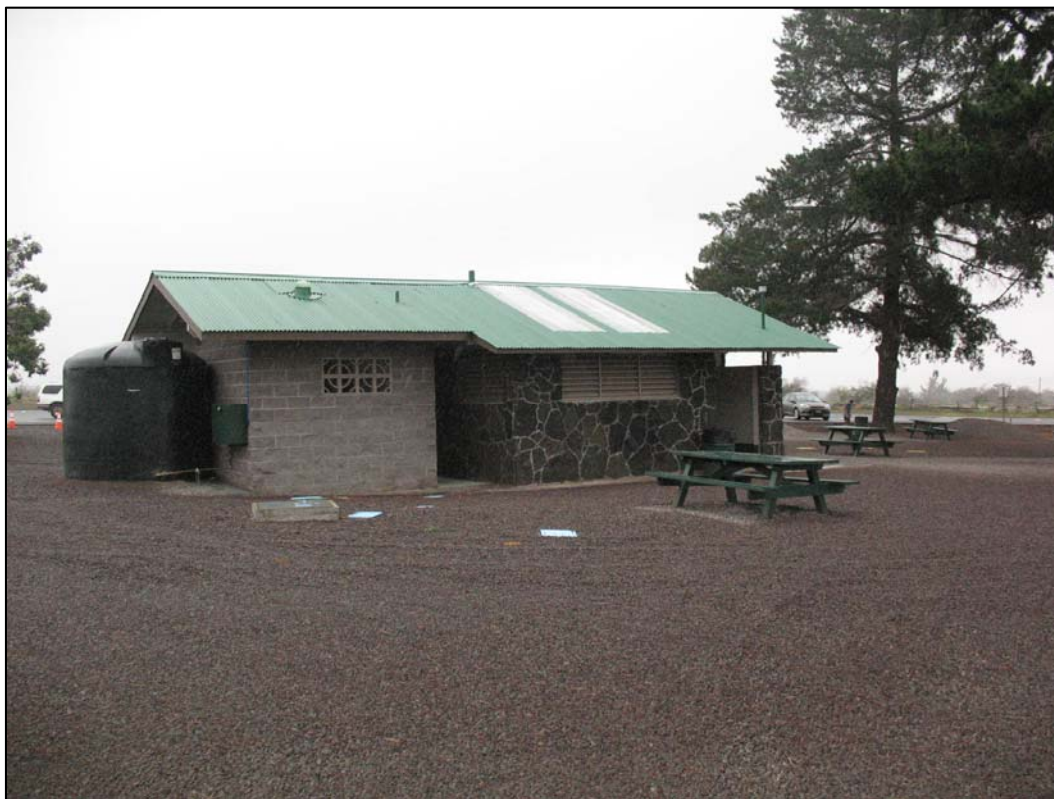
Comfort station northeast elevations with bare hollow-tile ADA addition at left and original lava veneer at right, view to the southwest.
